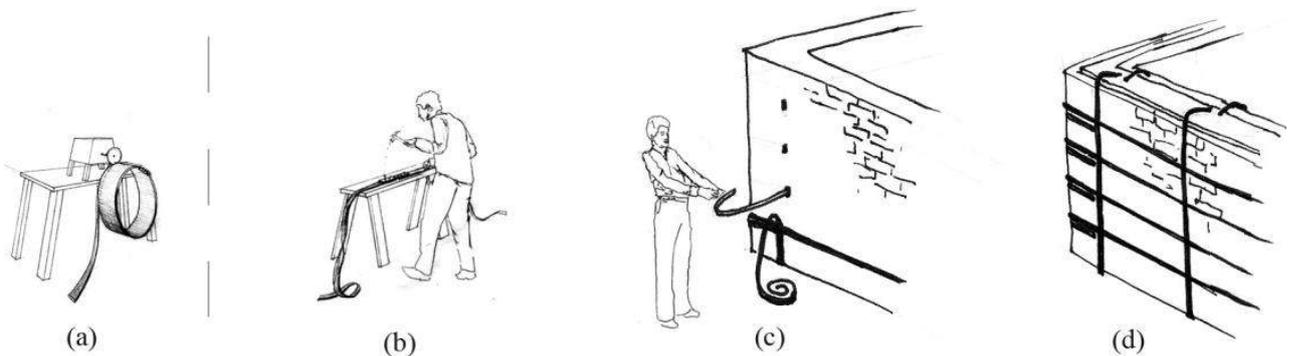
Steps in the process of reinforcing an earthen (adobe) house with tire straps. Step (a) is performed in a workshop or factory and (b) to (d) on site. (Courtesy Matthew French)
